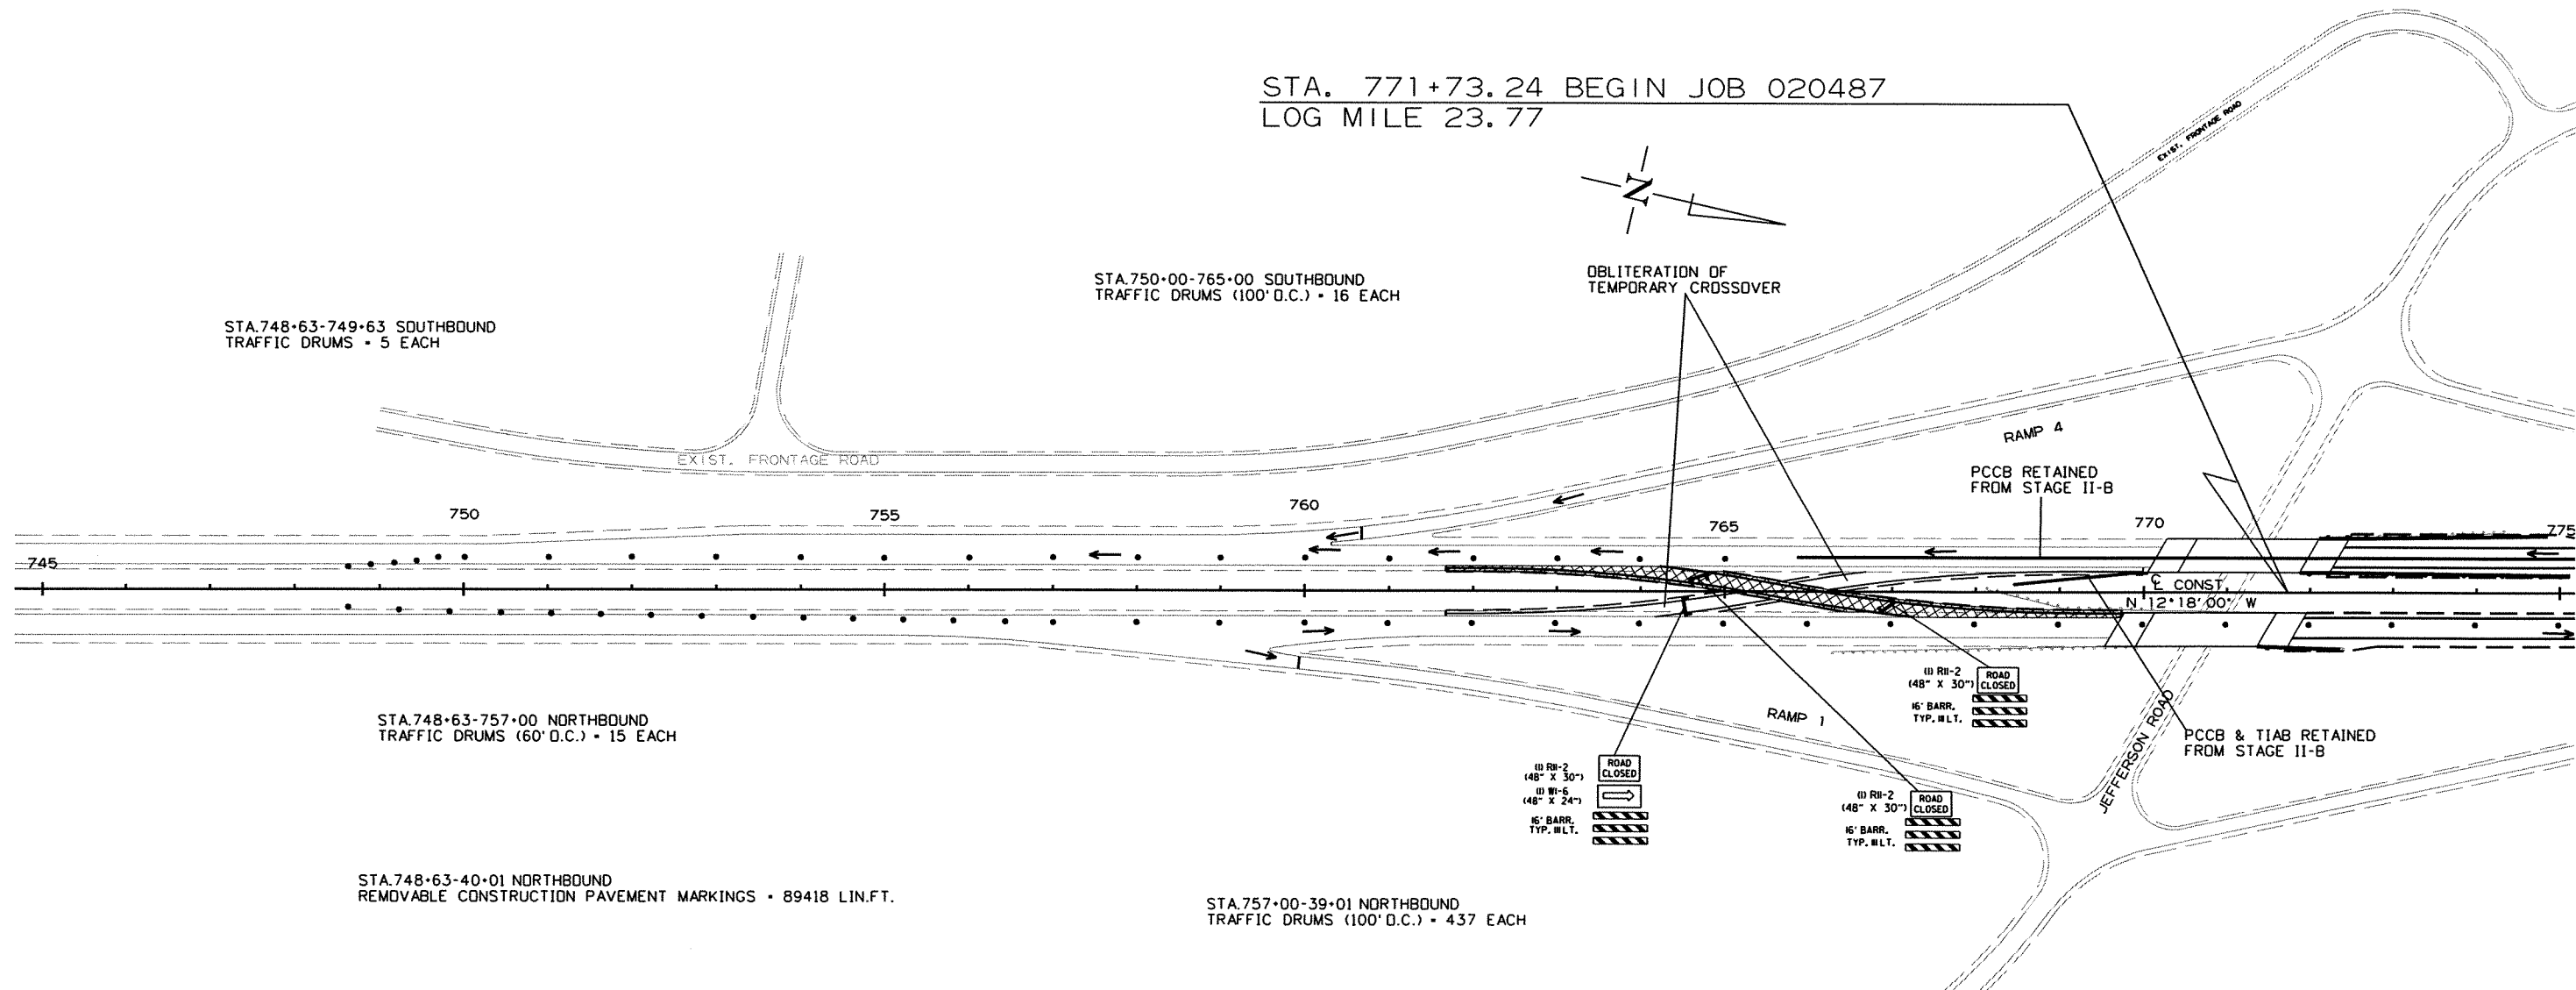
DETAIL OF PLACEMENT OF TRAFFIC DRUMS AND PRECAST CONCRETE BARRIER
